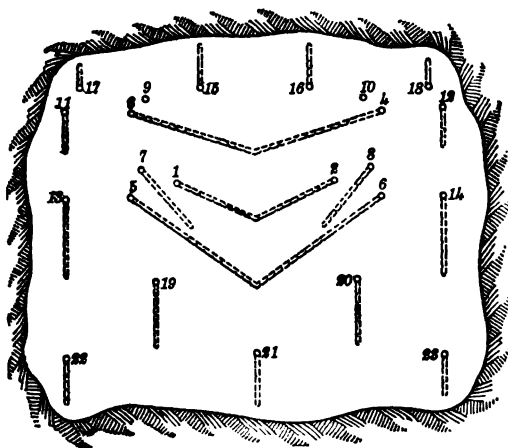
Wedge-cut round drilled from a horizontal bar mounting.
